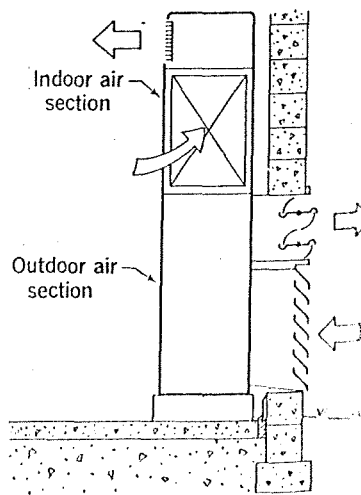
Vertical cabinet, single package, mounted inside conditioned space with outside air connection thru the wall.
